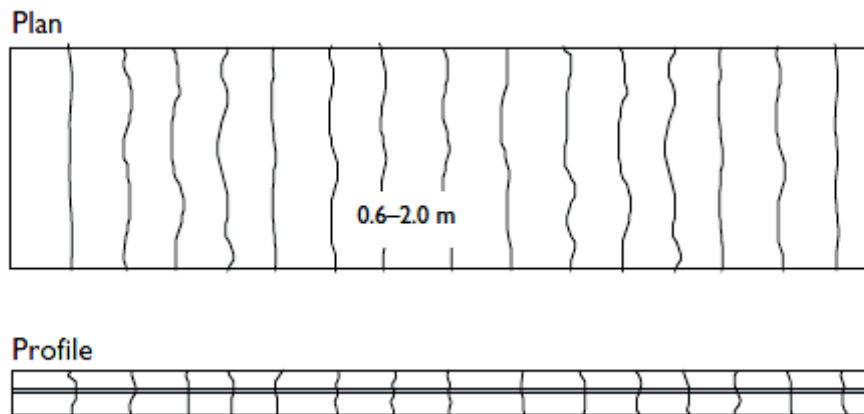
Continuously Reinforced Concrete Pavement (CRCP)
